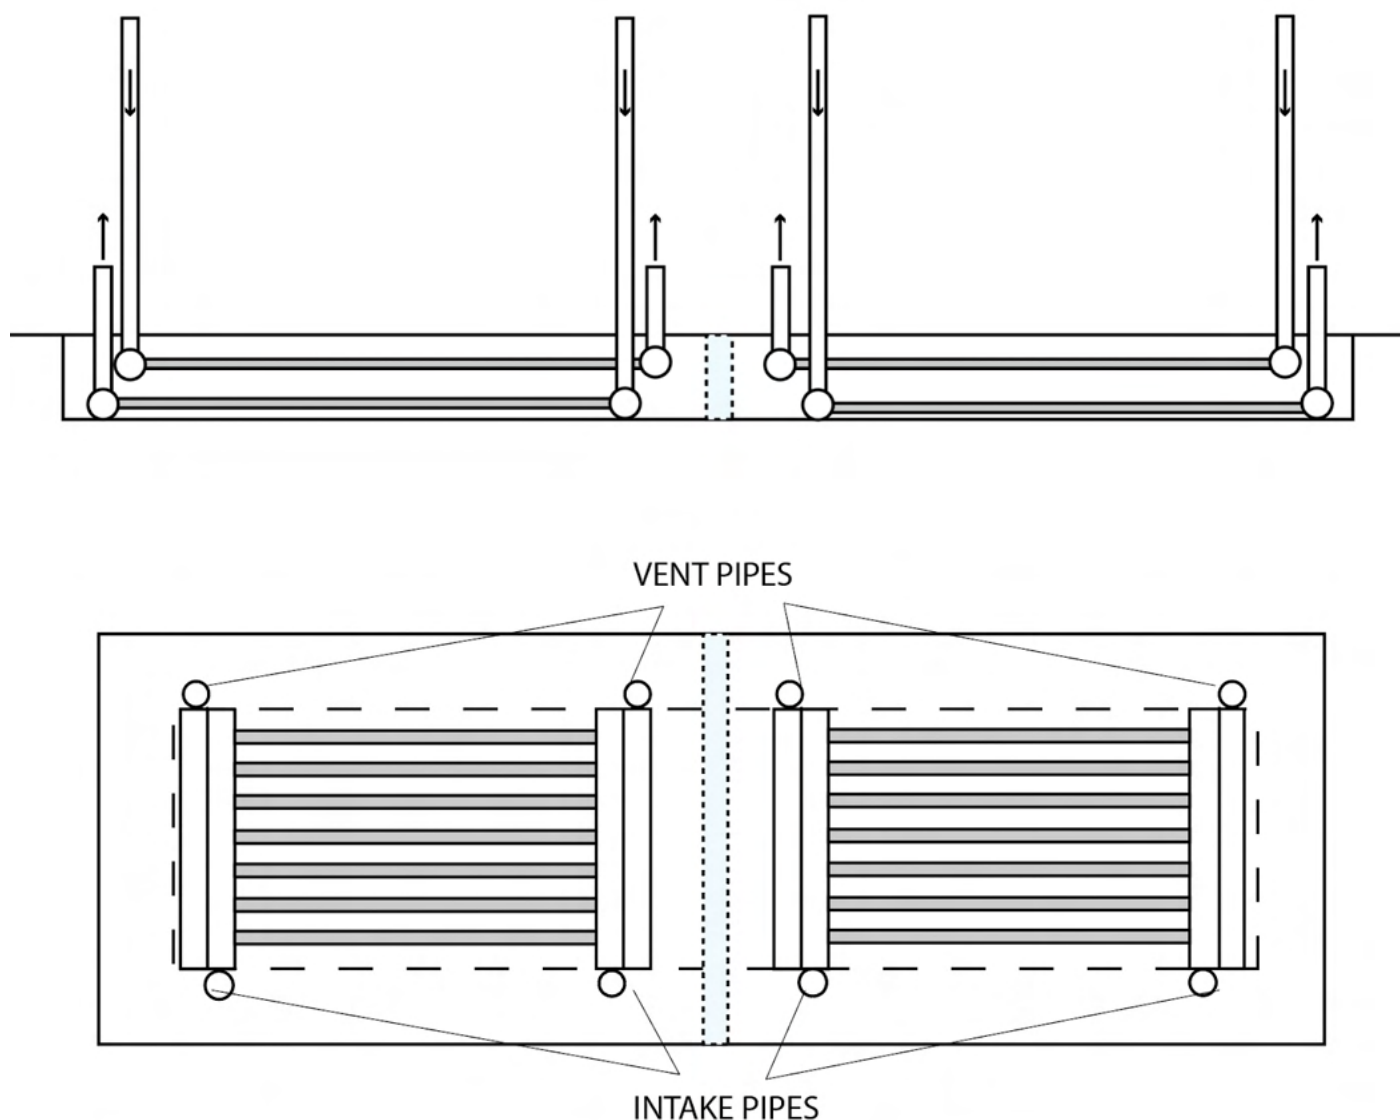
South Facing Elevation View and Plan View of the climate batteries with divider.
